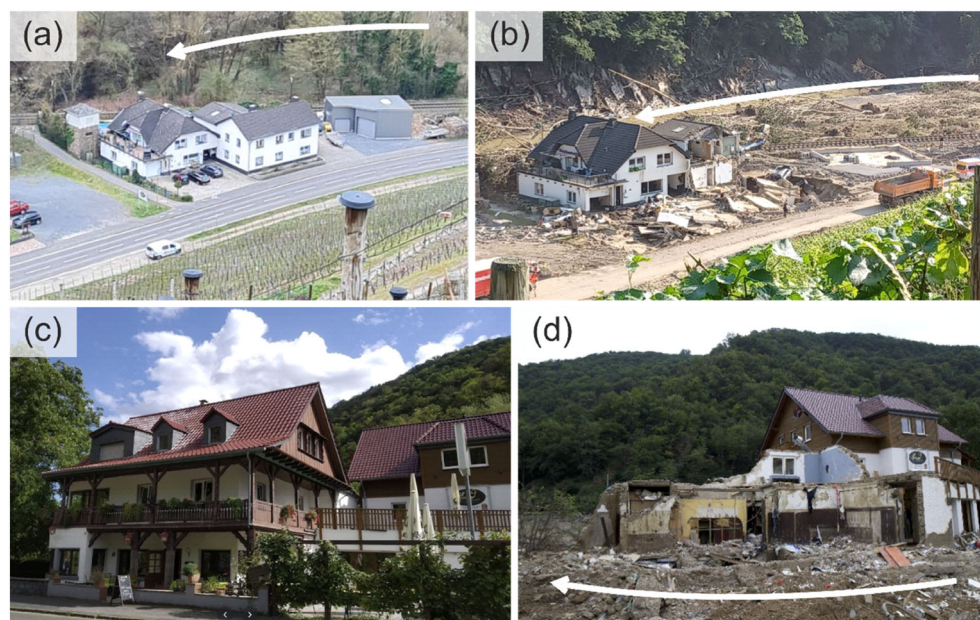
Figures (a, b) show a failure due to buoyancy and horizontal loads in Marienthal, and the floor plan layout; (a) before flood; (b) after the flood. Figures (c, d) show the failure of the L-shaped floor plan layout; (c) before flood; (d) after the flood [Source: (a, b) Photographs by Moni Körtgen, house owner. (c) Google photos; photo courtesy of Heidi Möller on August 2020. Date accessed: 30 August 2022] (Möller, 2020). Arrows indicate presumed flow direction.
